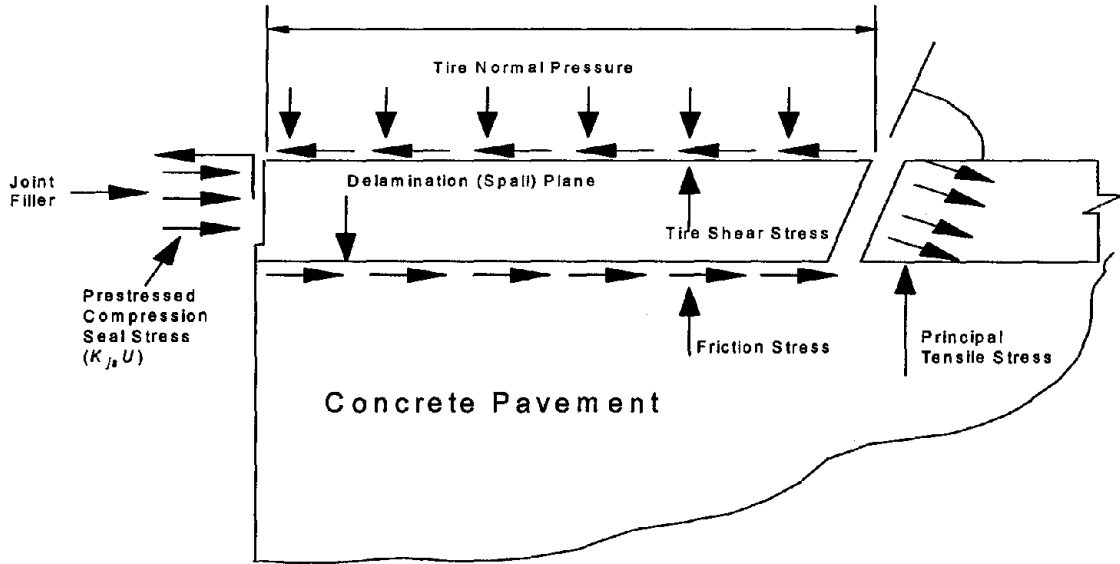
Schematic diagram of spalling mechanism for tensile mode of failure in jointed concrete pavement.<sup>(47)</sup>
